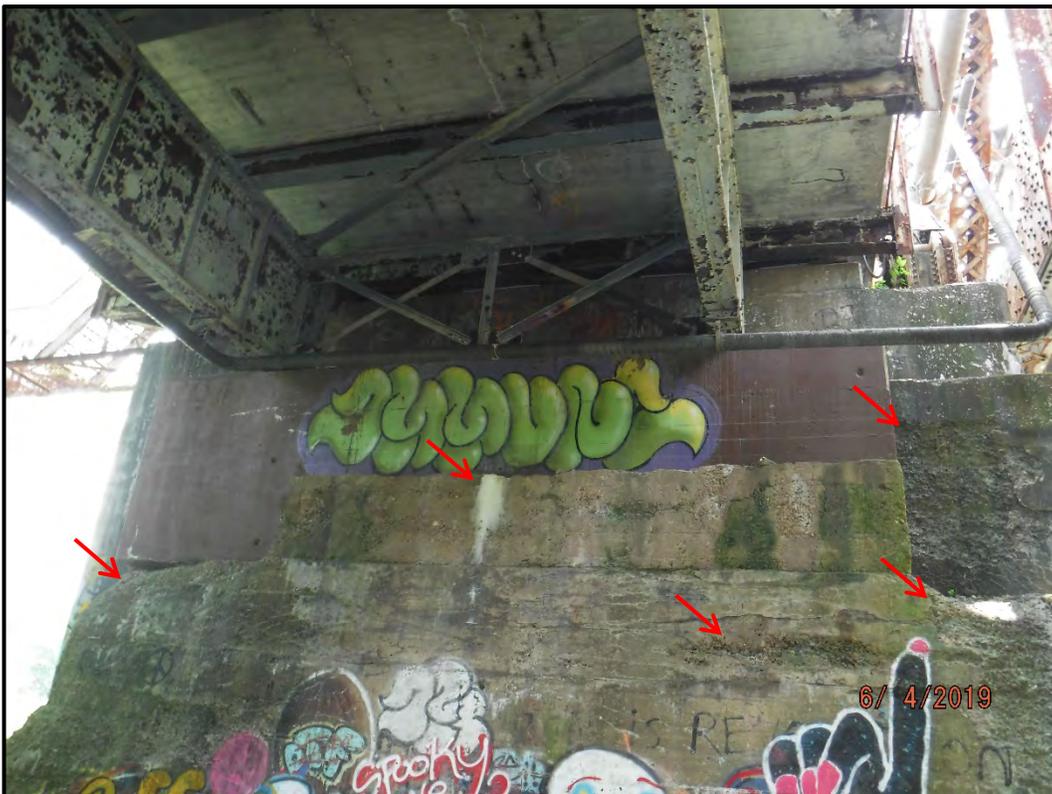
West face of the Pier 6 concrete cap has map cracking and deterioration throughout that has caused the exterior layer of cement to crumble. Note the heavy efflorescence at the center line of the cap.
